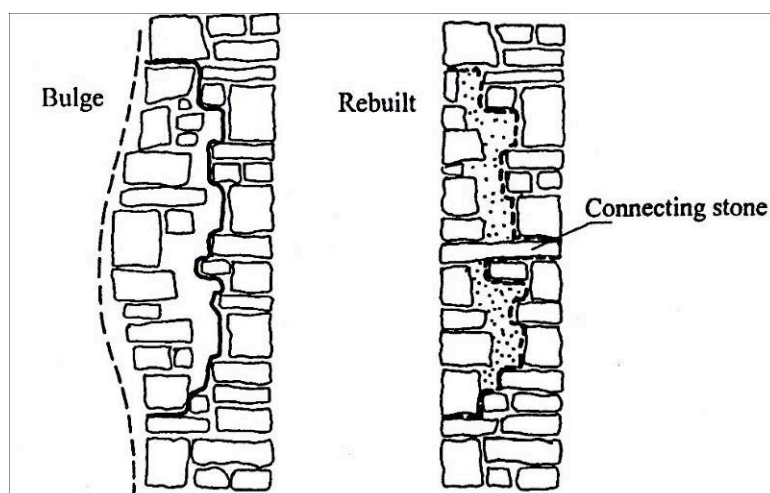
Reconstruction of a bulged stone-masonry wall [21]
